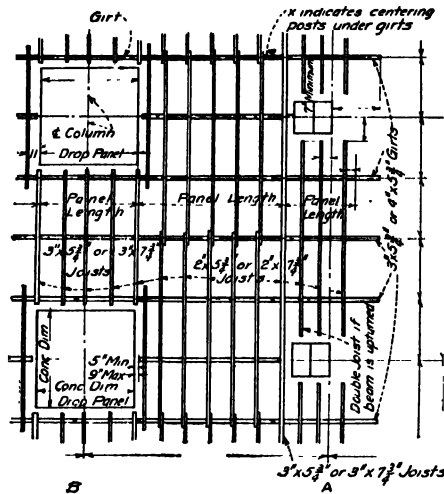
Assembly plan for exterior bay—flat slab floor.
